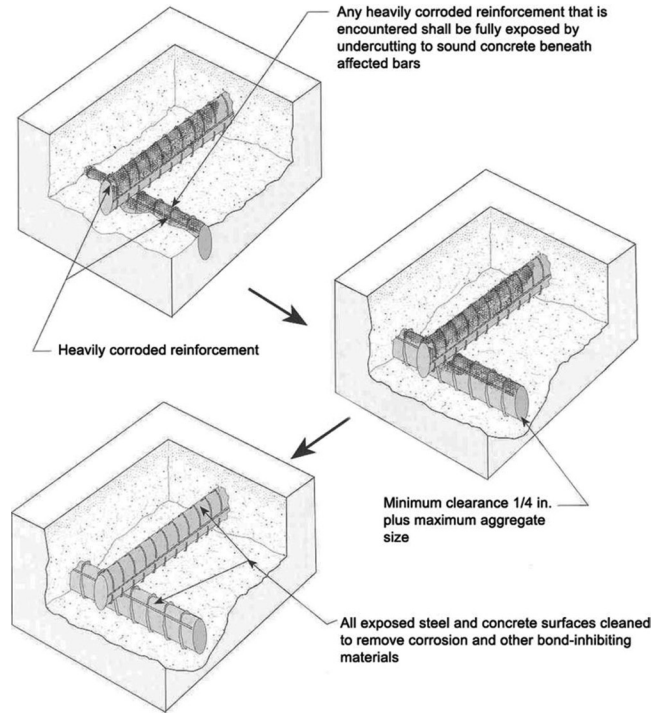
Removal of concrete from around reinforcing bar (adapted from ICRI 310.1R-2008, formerly No. 03730).
